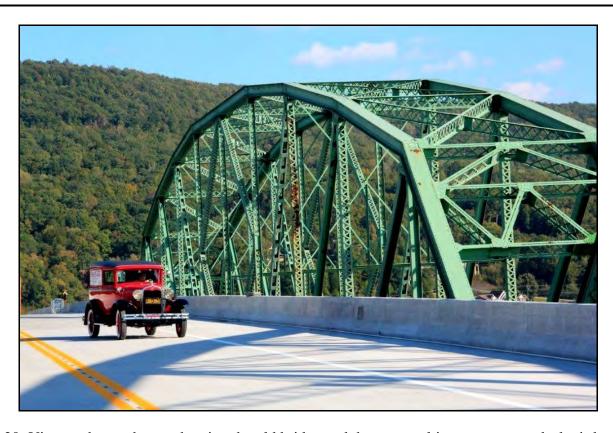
View to the northwest showing the old bridge and the new multi-span concrete deck girder bridge.
